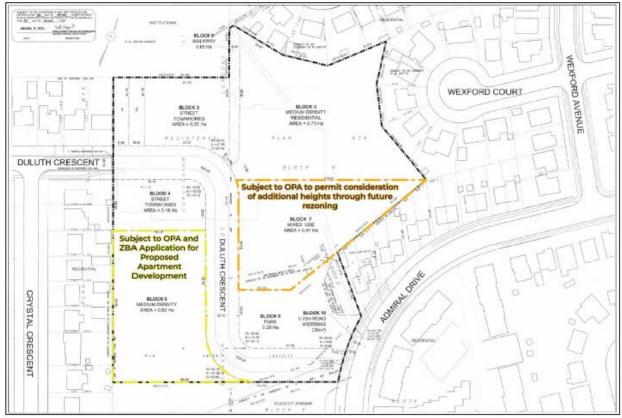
Proposed Draft Plan of Subdivision with Block 5 and Block 7 outlined.
